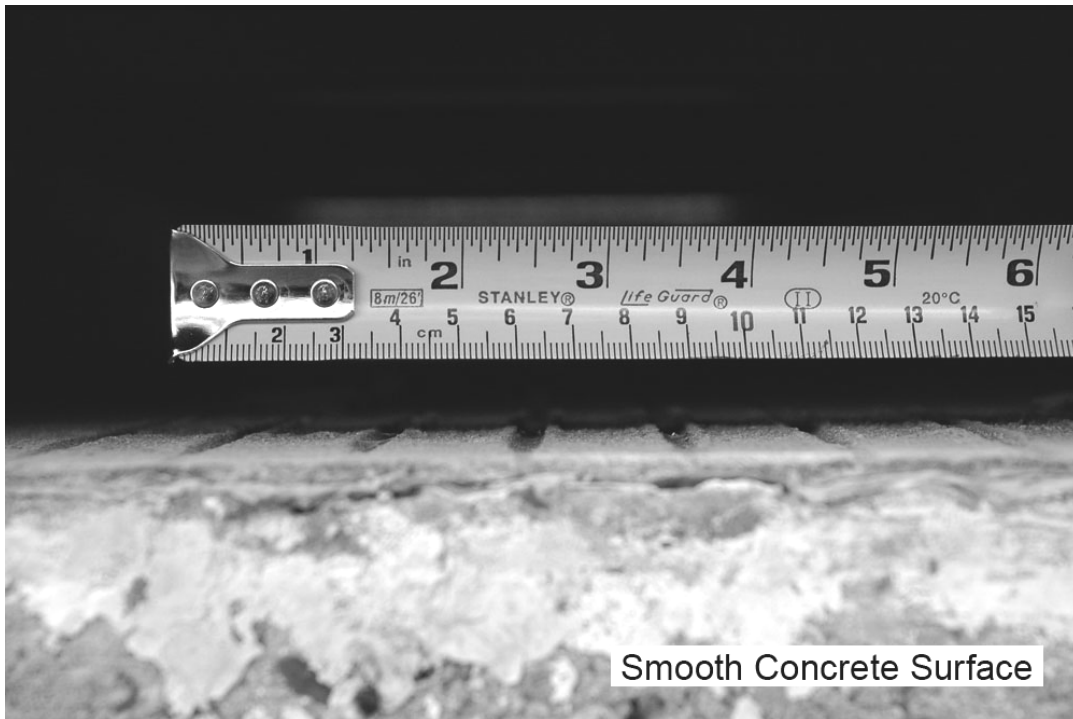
Smooth concrete roadway surface (longitudinal cross-section)
